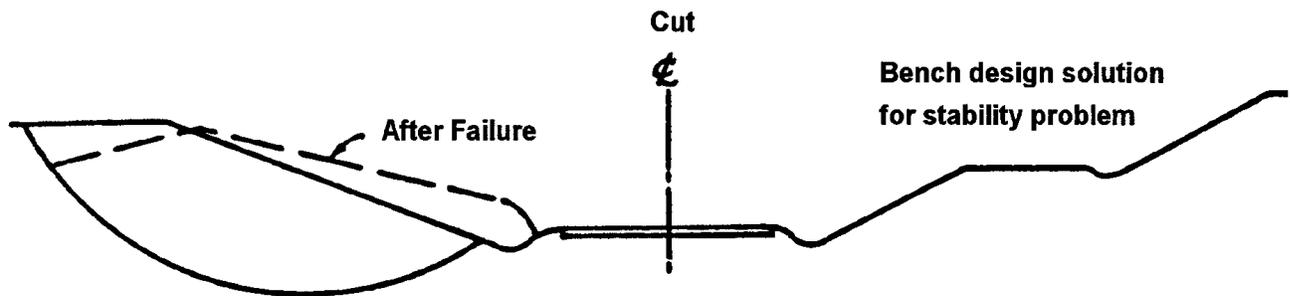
Deep Seated Slope Failure (Left) and Bench Slope Design (Right) to Prevent Slope Failure.
